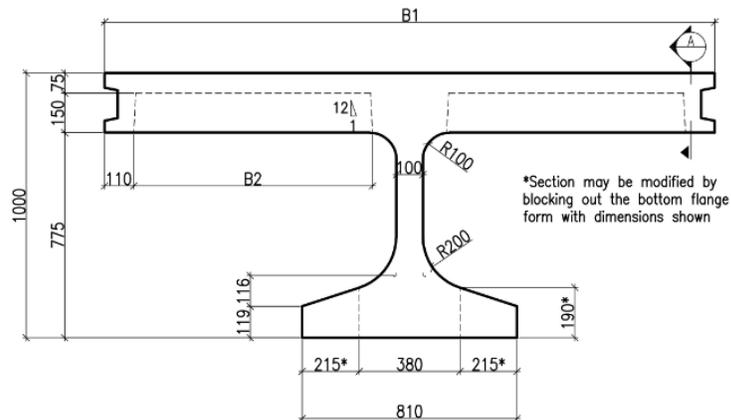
Proposed UHPC DIB Bridge Elevation
